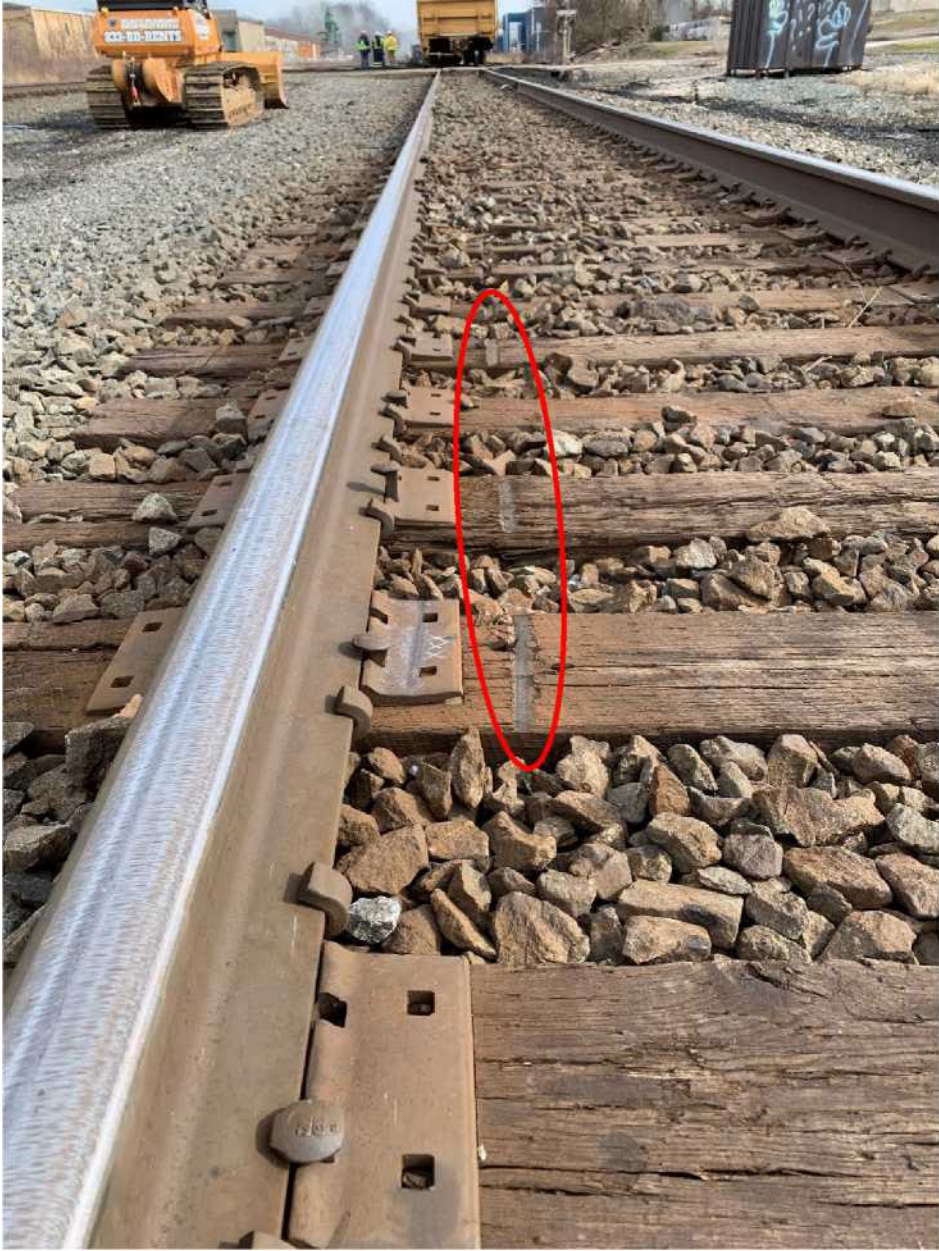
Wheel flange derailment markings at milepost PC 49.32
